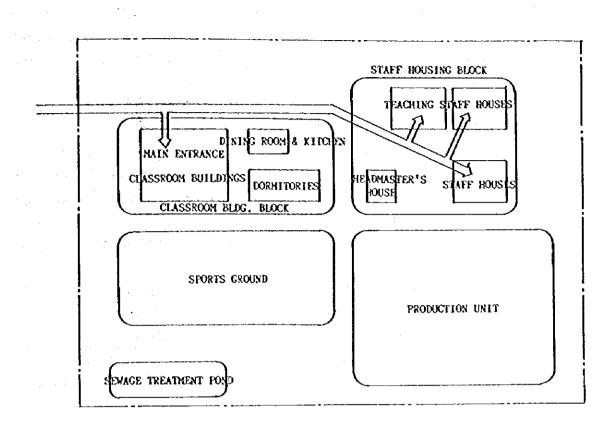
ZIMBA SITE CONCEPT PLAN
